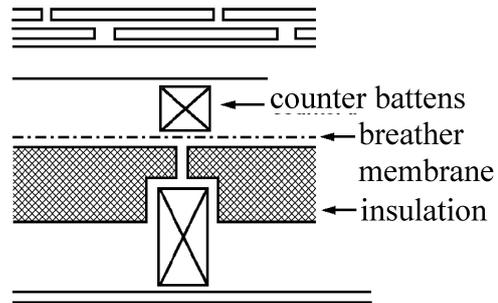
Roof type B insulation on a sloping ceiling
